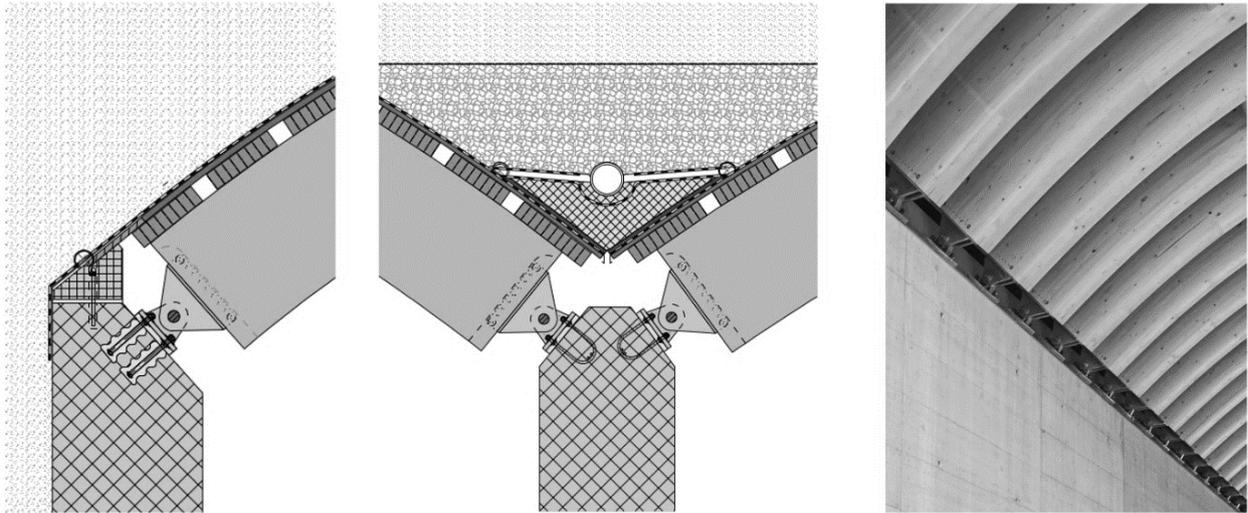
Construction of the support areas of the side wall (left) and the centre wall (right). Middle: Section through steel joint
